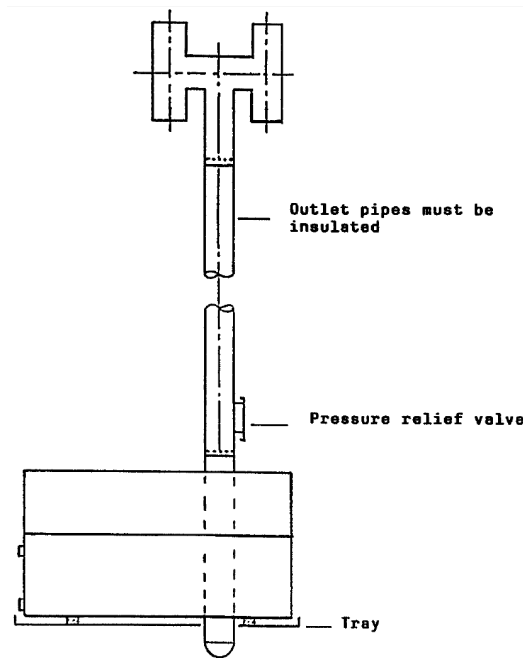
shows a basic plan for the installation of ventilation pipes.
